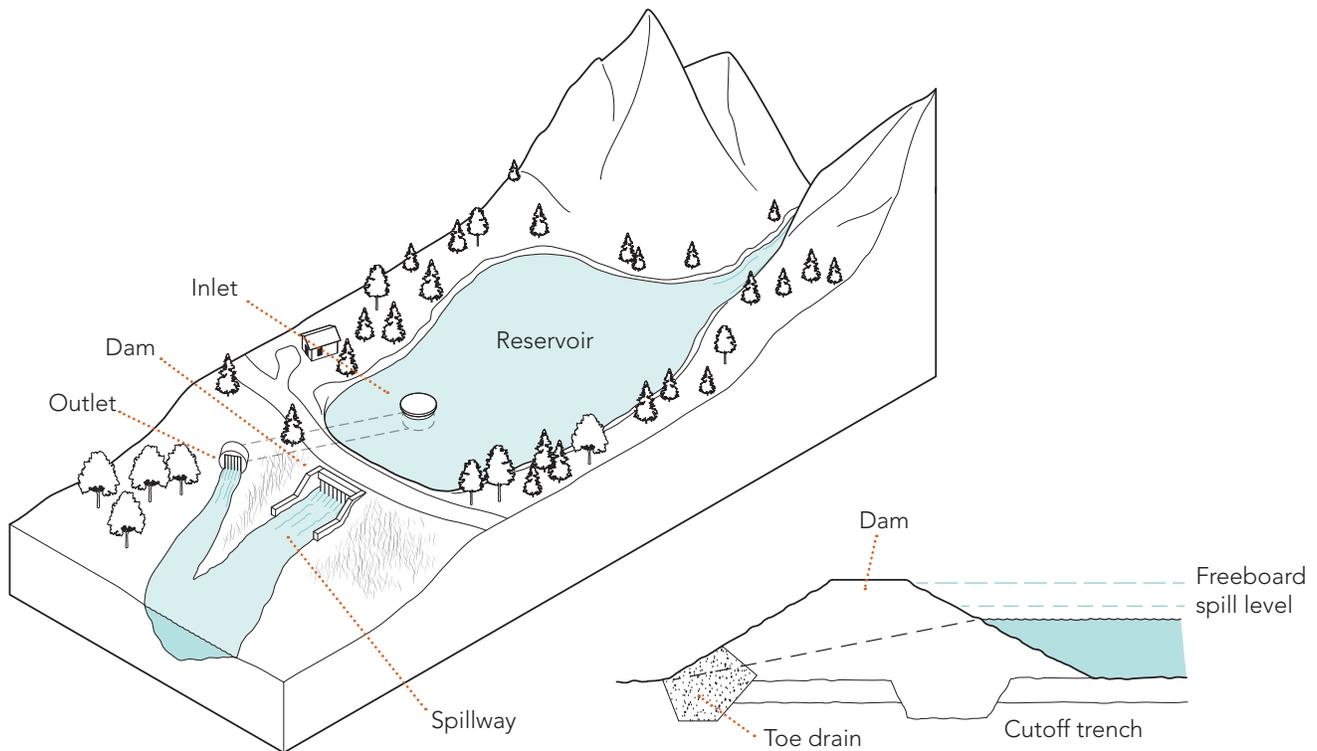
A GENERIC LAYOUT AND CROSS SECTION OF A SMALL DAM
